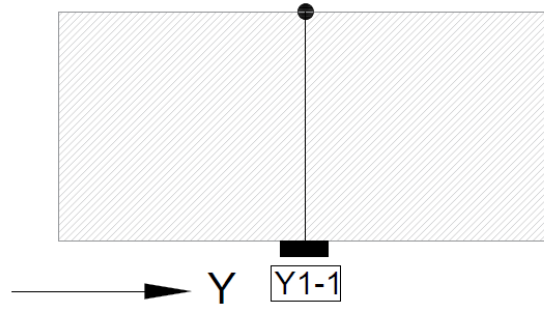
Piers arrangement for all walls of school WPL along Y axis
